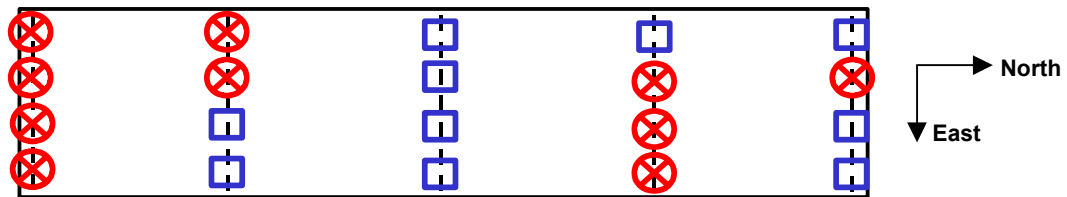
Locations of failed puddle welds after Test #9 (DDR = 2.27 %)
